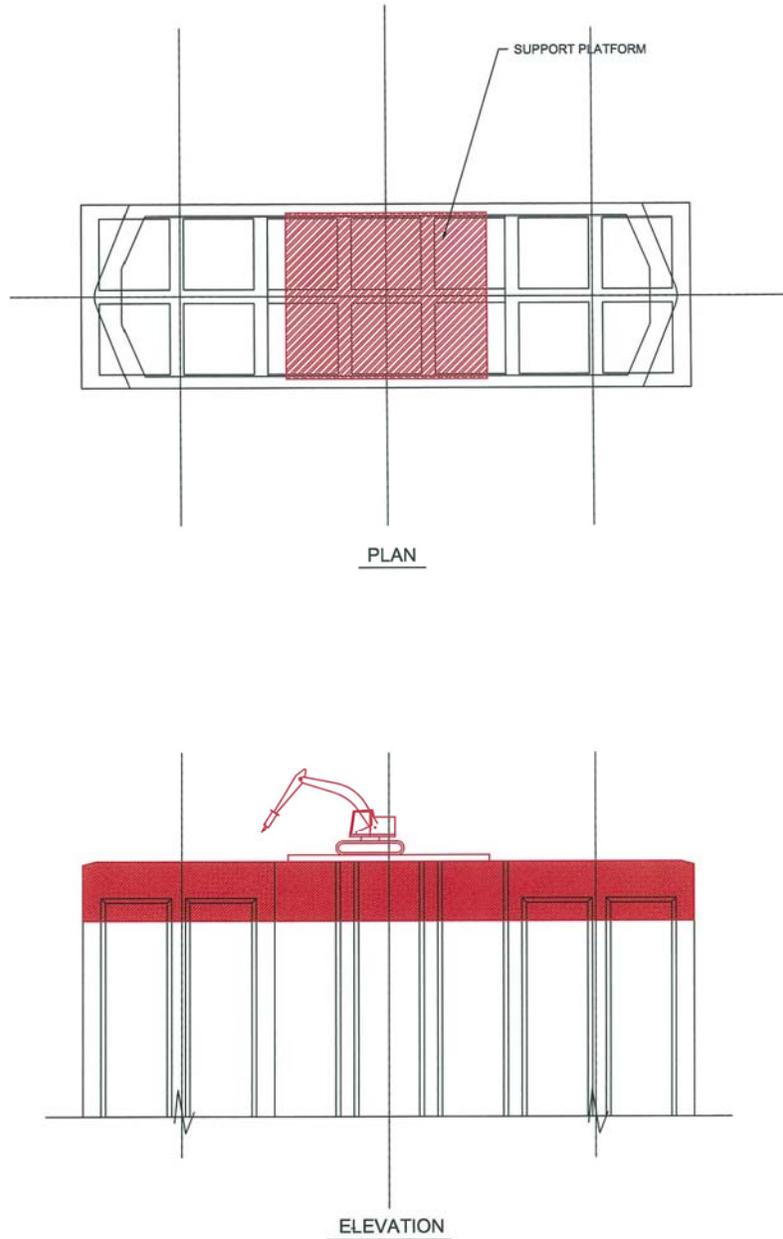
Pier E3 schematic. Elevation view depicts an excavator dismantling the outer portions of the pier cap after concrete pedestals have been removed. Plan view shows an installed platform over open inner cells to support the equipment used for dismantling.
